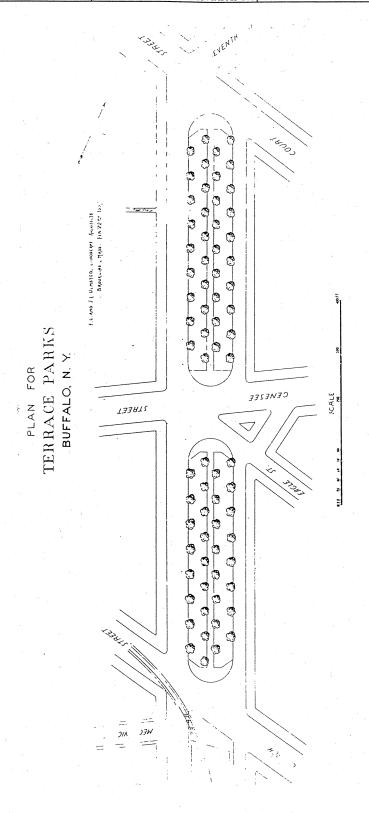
Plan for Terrace Parks, Buffalo, New York, F.L. & J.C. Olmsted, Landscape Architects, Brookline, Mass, February 22, 1887. Courtesy Beveridge collection.
